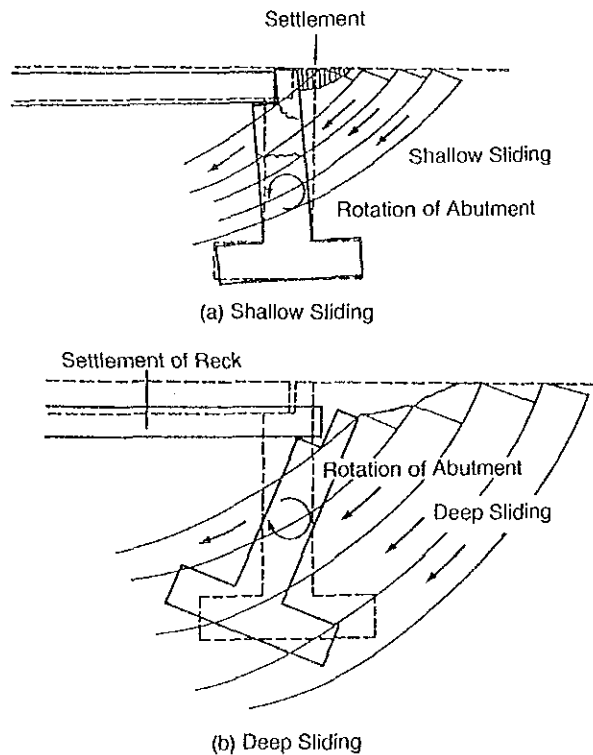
Damage of Bridge Abutments due to Soil Instability
